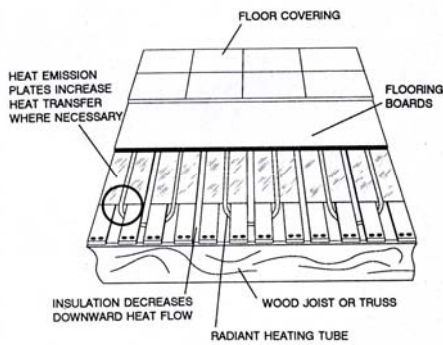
Pipes embedded in a wooden floor construction, Type G (15377-1, [11])
